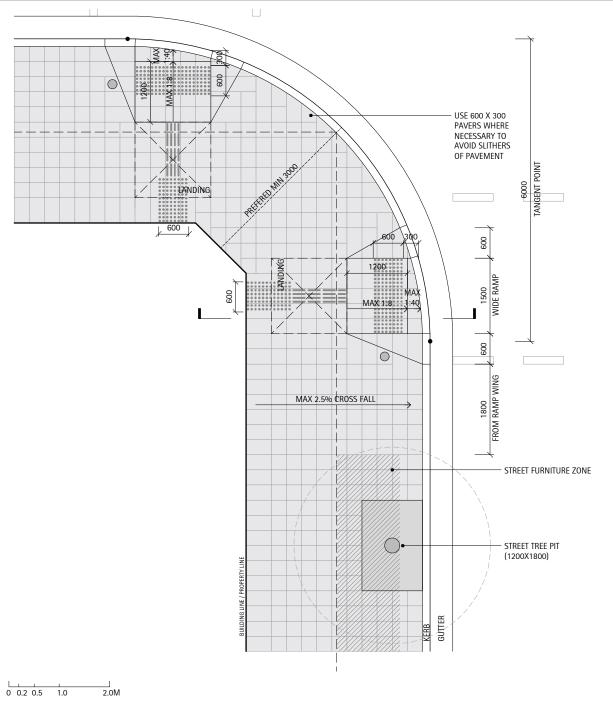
Streets Corner Plan: 6000 Radius 1500 Ramp
